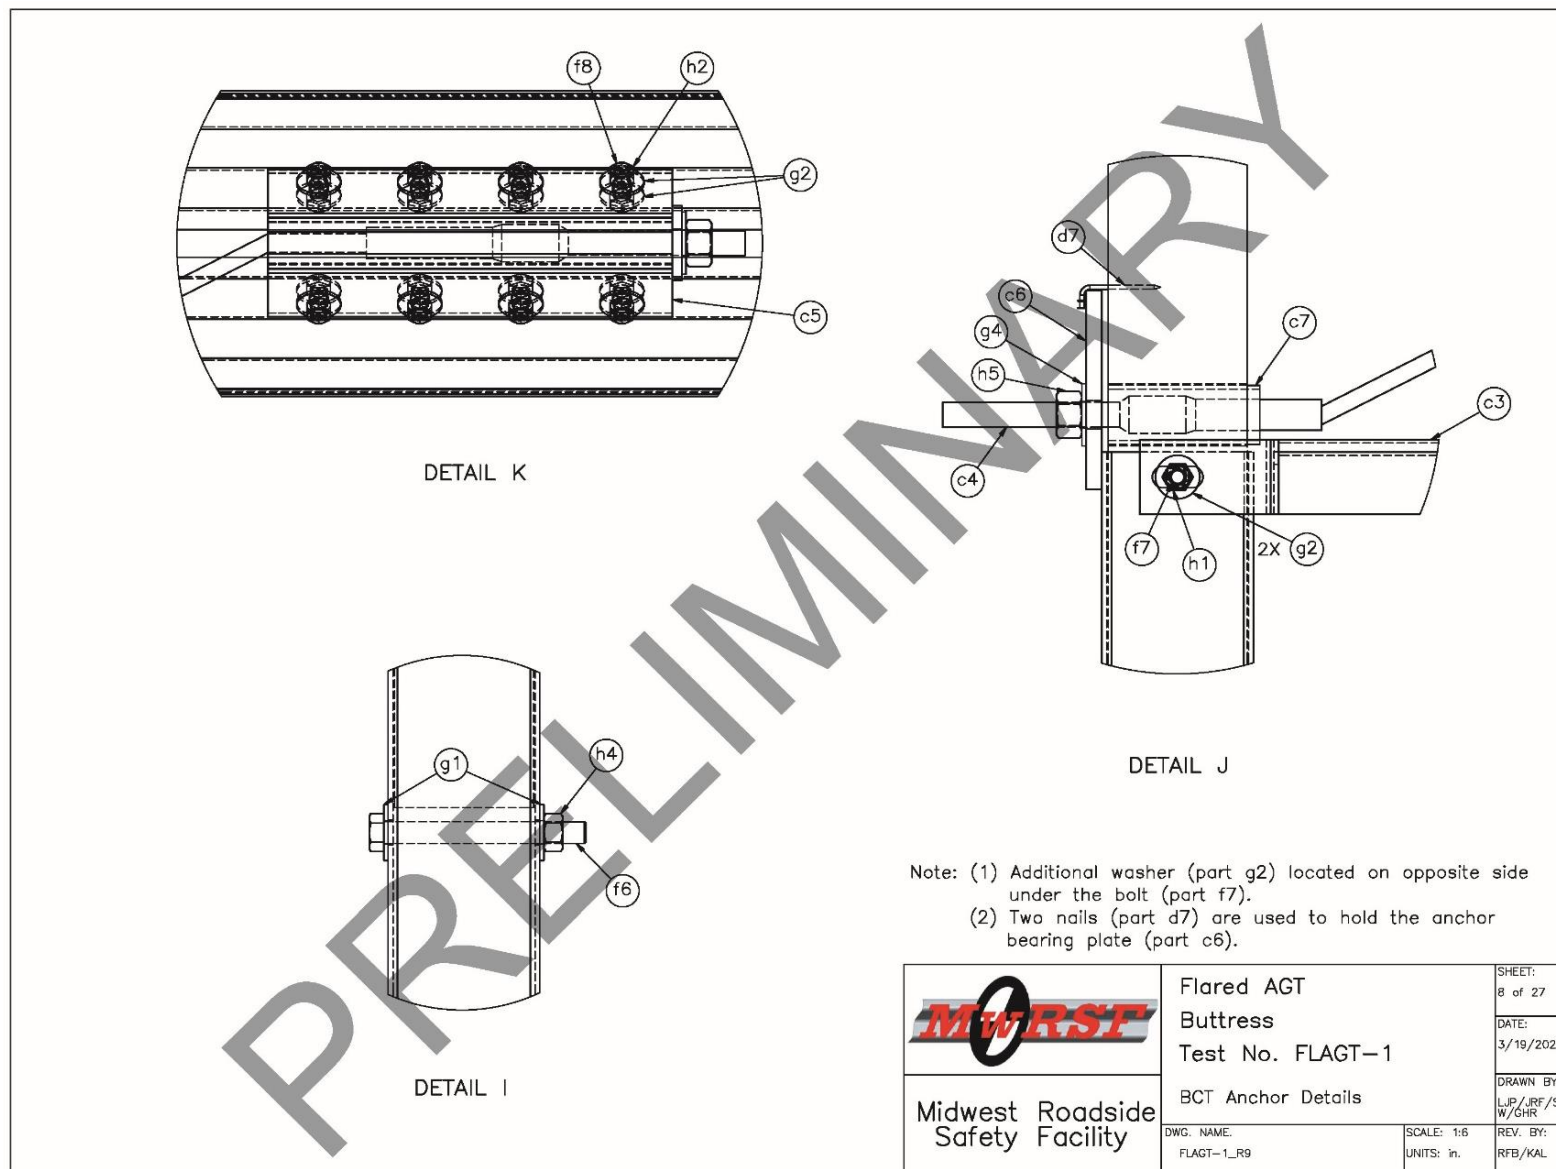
BCT Anchor Details, Test No. FLAGT-1
